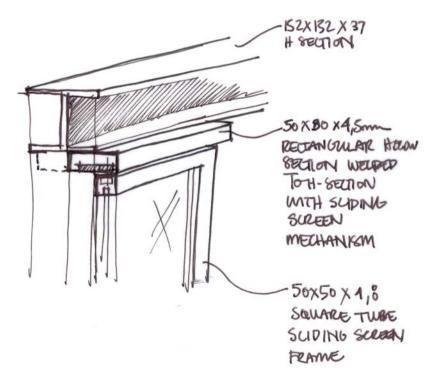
Sketch of structural support of protruding glazed sliding screen facade
